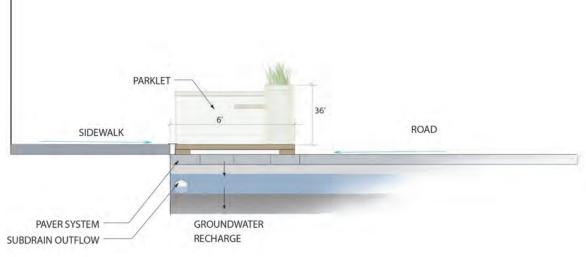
Permeable Paver + Parklet Stormwater
